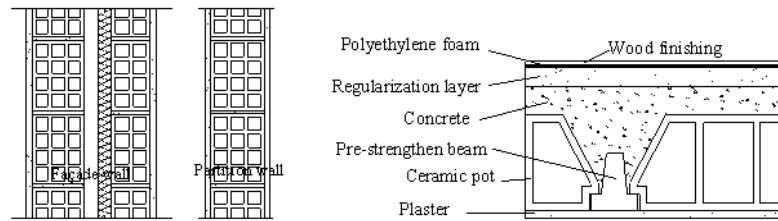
Vertical cross-section of the construction solutions of the walls and floors of the buildings (external and partition elements)
